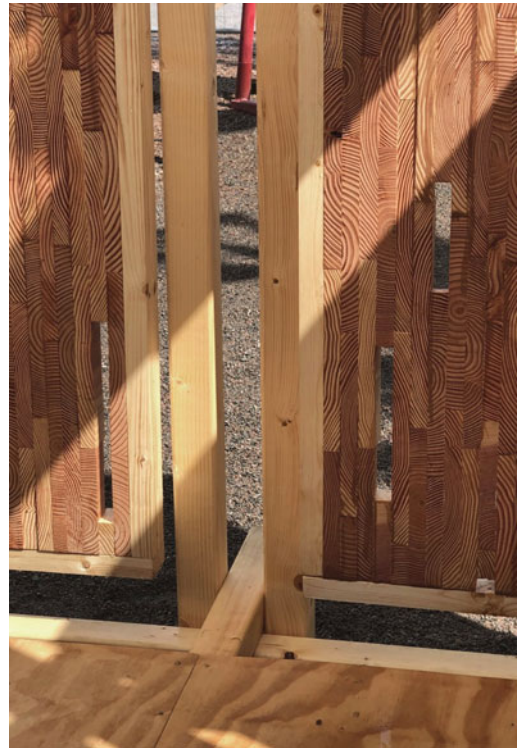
Light pavilion; interface detail illustrating cladding arrangement. Sensory panel system fixed with a proprietary stainless-steel suspension system. Image ©
